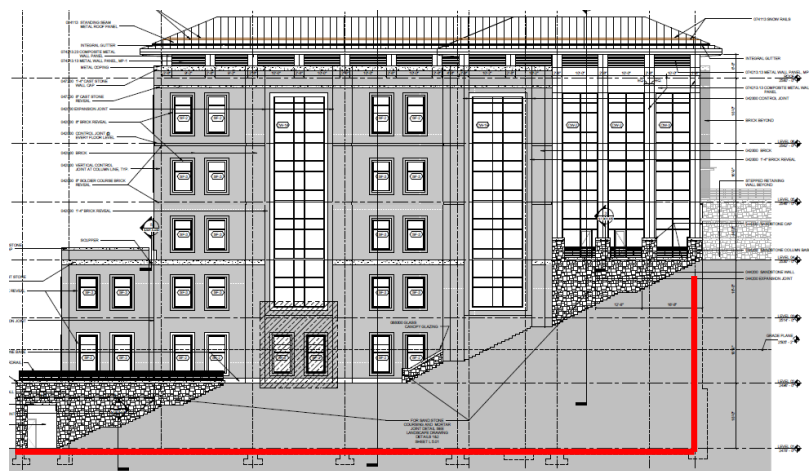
South Elevation Showing Building's Depth into Hillside (Sheet A-3.01)
